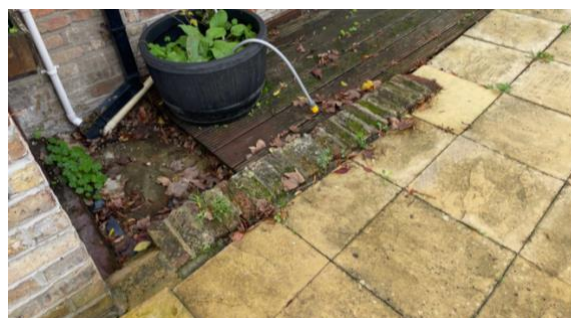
remnants of previous garden wall, indicating the line of the proposed rear extension
